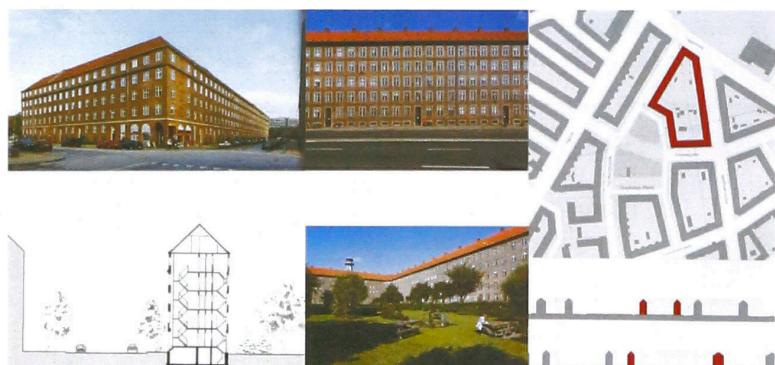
Copenhagen Megablock, photos, plan and section. Dwelling units in this building have access to both facades as well as 2 sets of stairs, the public one off the street and "private" or service stair facing the courtyard's interior.
